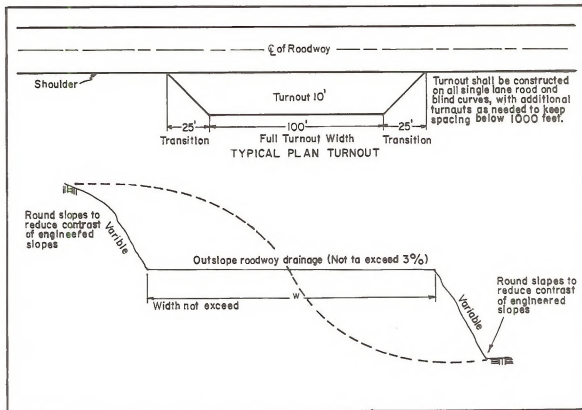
TEMPORARY ROAD BUILT FOR HAULING DRILLING EQUIPMENT FROM ONE SITE TO ANOTHER.
